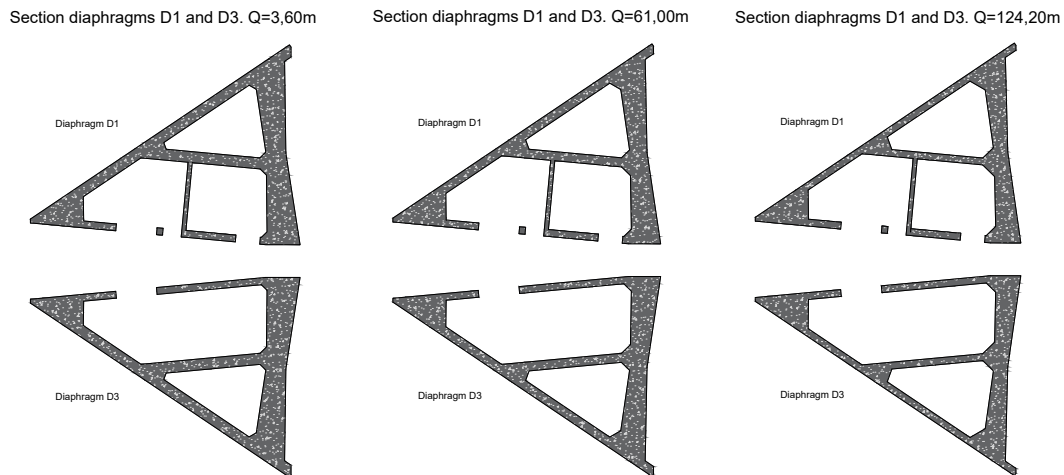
Transversal sections of the left triangular elements. From Drawing 4.
